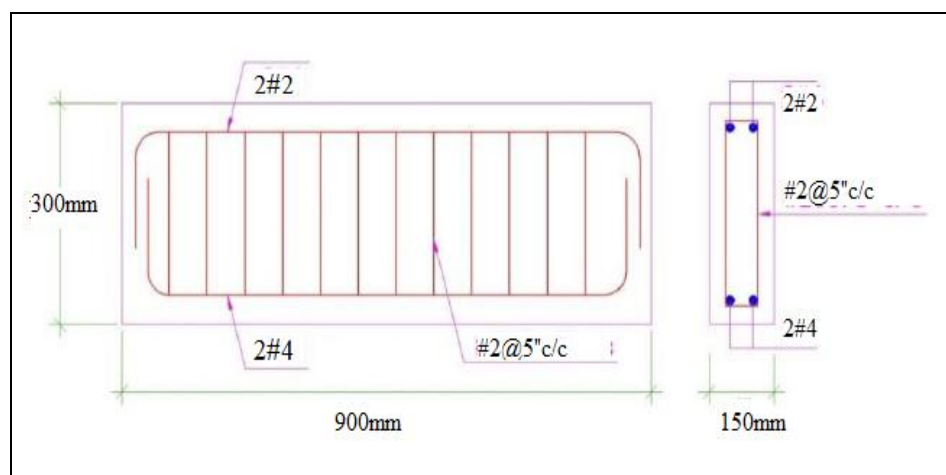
X-section and Longitudinal Section showing reinforcement Detail of deep beam
